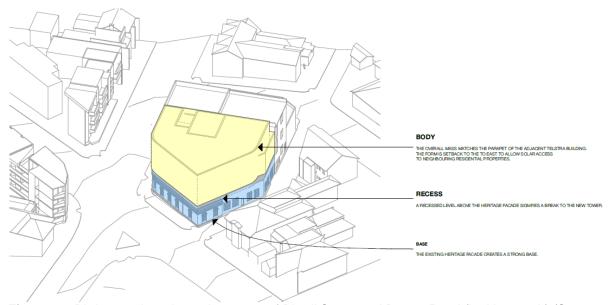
Birds eye view above the corner of Birrell Street and Bronte Road (looking north) (Source: MHN Design Union)
